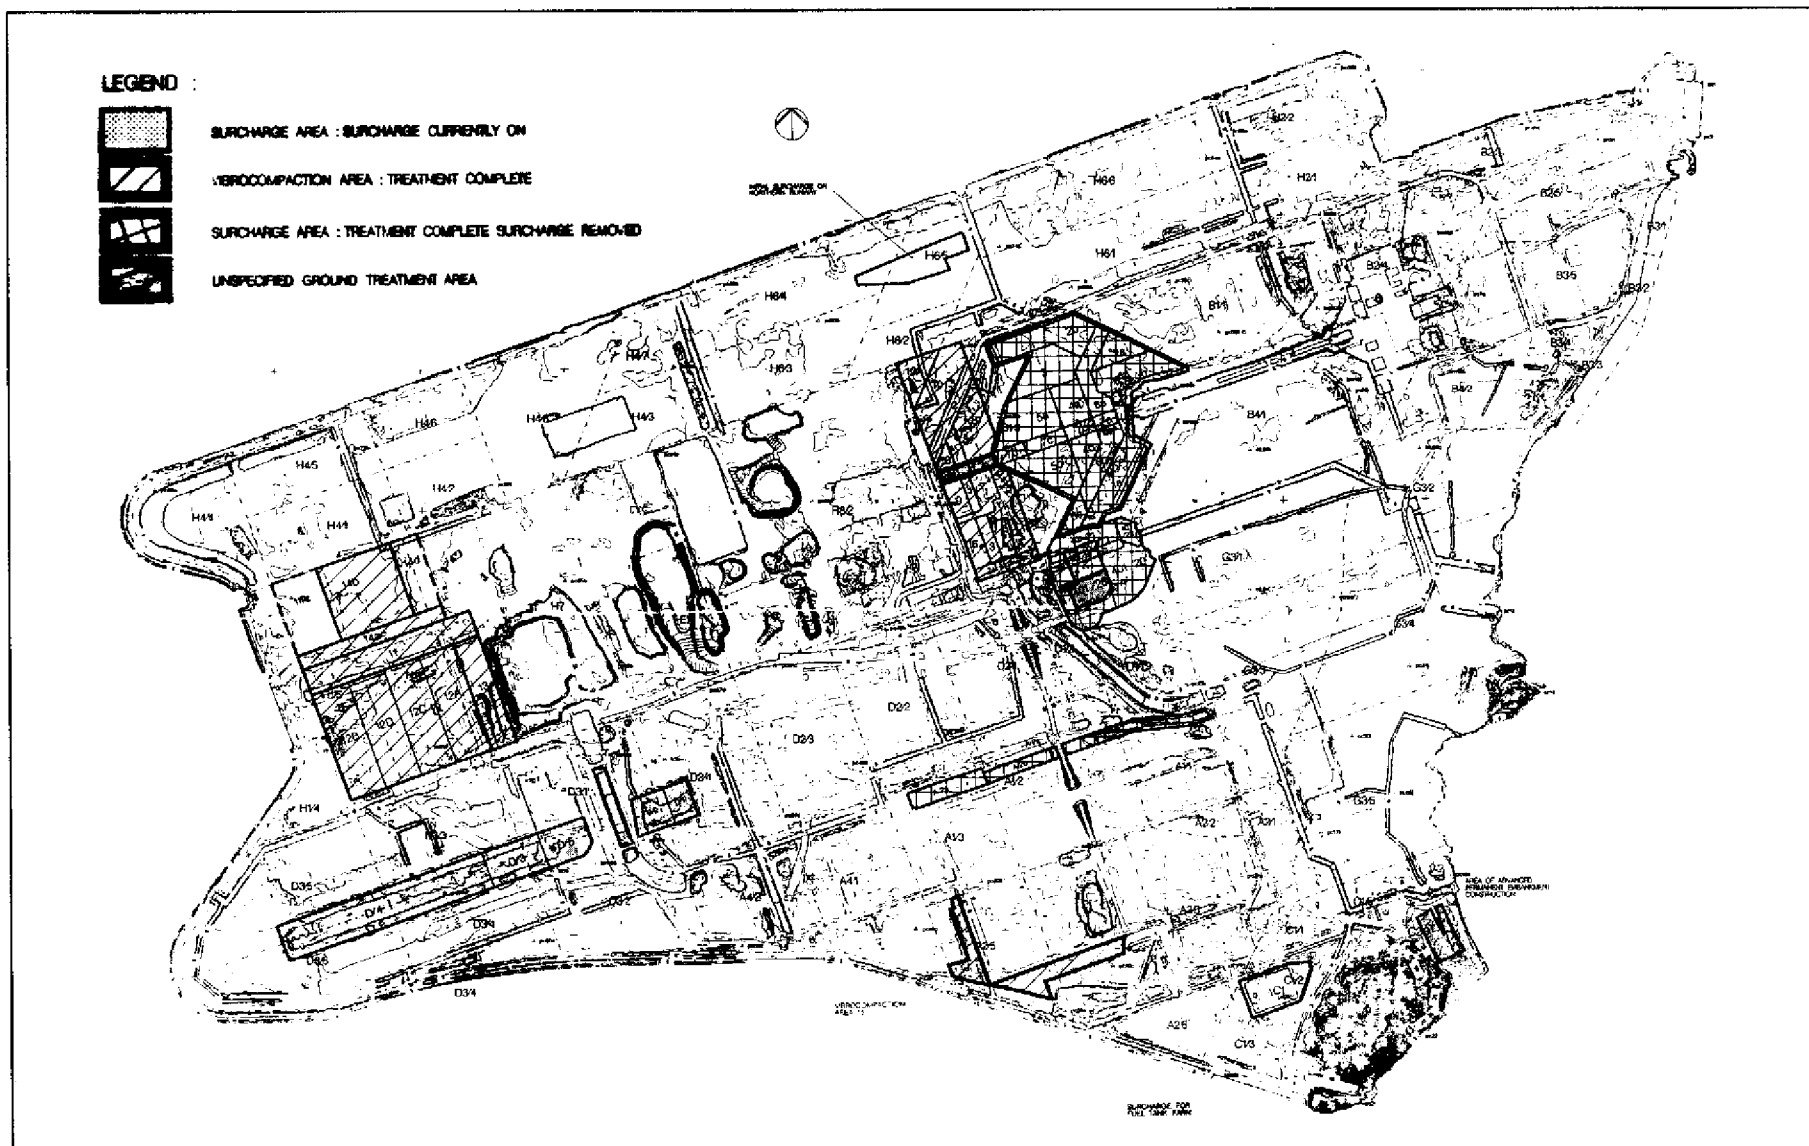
Ground Treatment Layout Plan at the CLK Site
